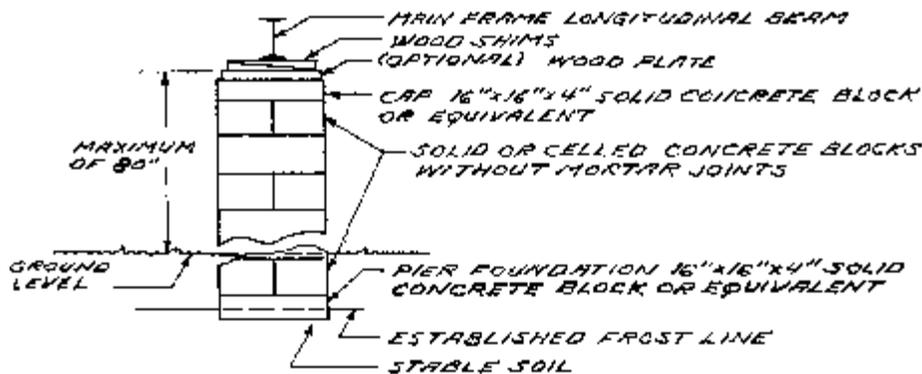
PIERS OVER 40" IN HEIGHT AND NOT EXCEEDING 80" IN HEIGHT (DOUBLE BLOCK CONSTRUCTION)
